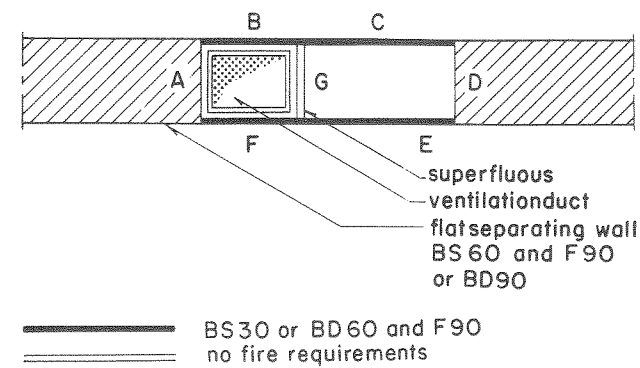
Pipe space service unit as flat separating wall; fire requirements at multistorey dwelling houses
